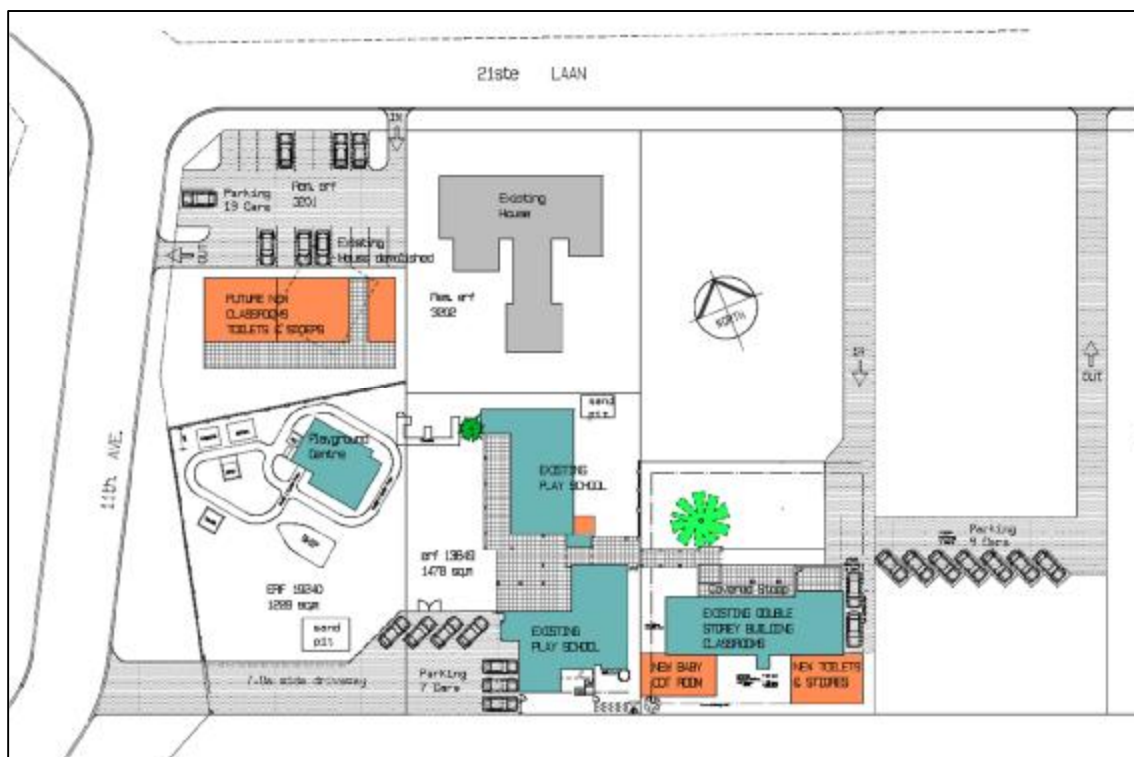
APPROVED SITE DEVELOPMENT PLAN (2015)
